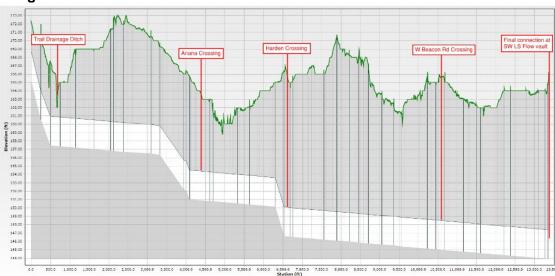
Alternative 4 – Trail/Lotus/Forest Park Route Profile
